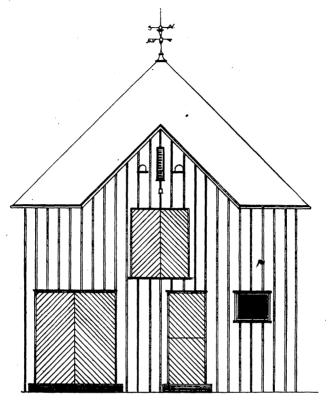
Front elevation of \$275 barn. (Design No. 2.)
